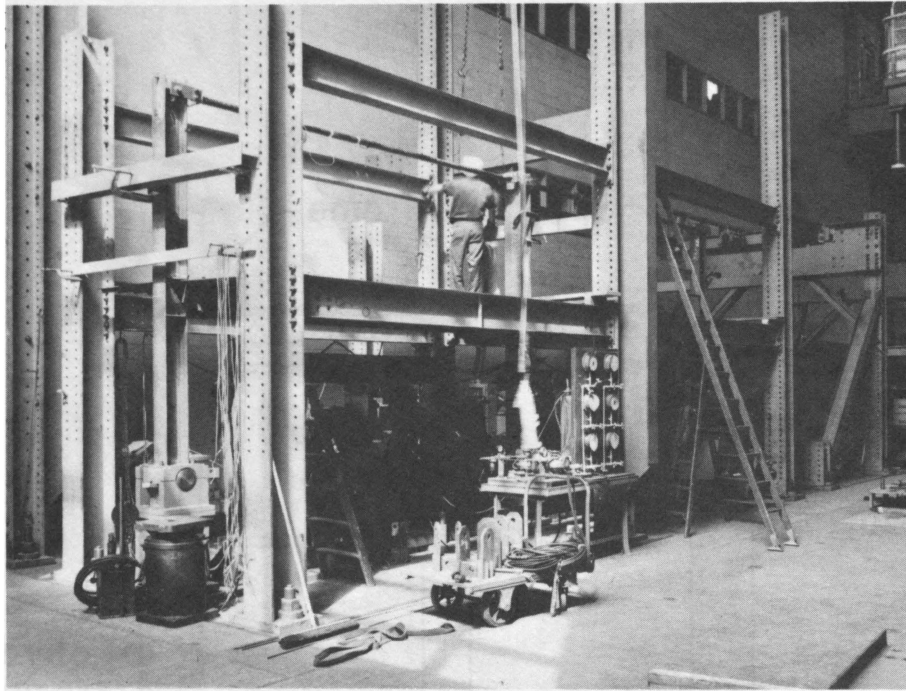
Steel Frame of CA-2 Ready for Welding
